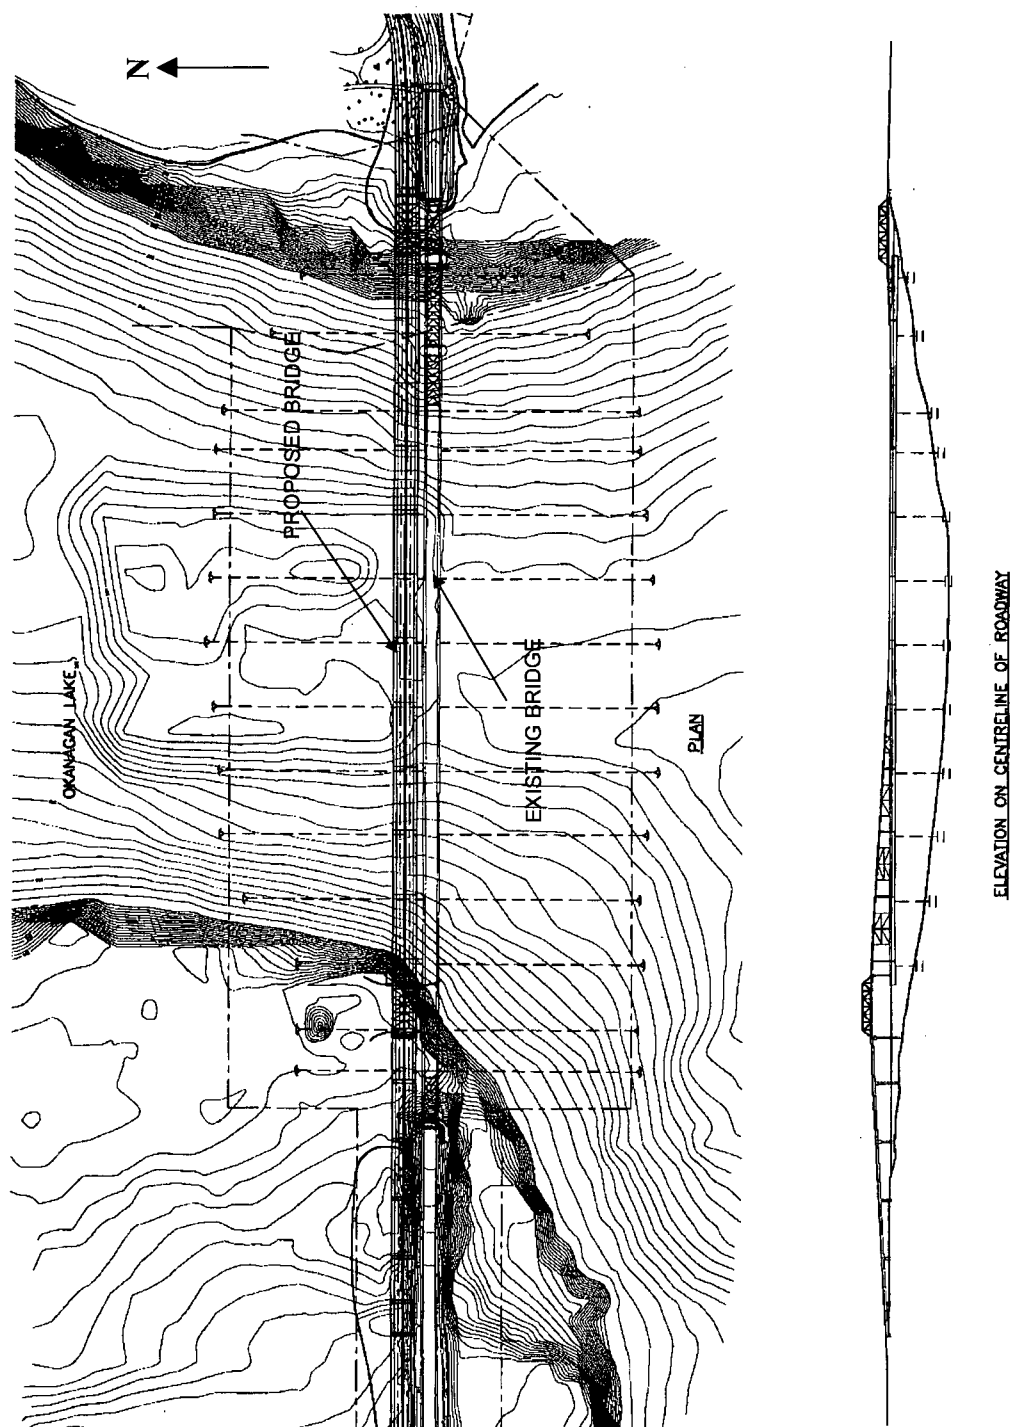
Plan and elevation views of the proposed four-lane floating bridge in Kelowna, British Columbia, Canada. The existing bridge is south of the proposed bridge.
